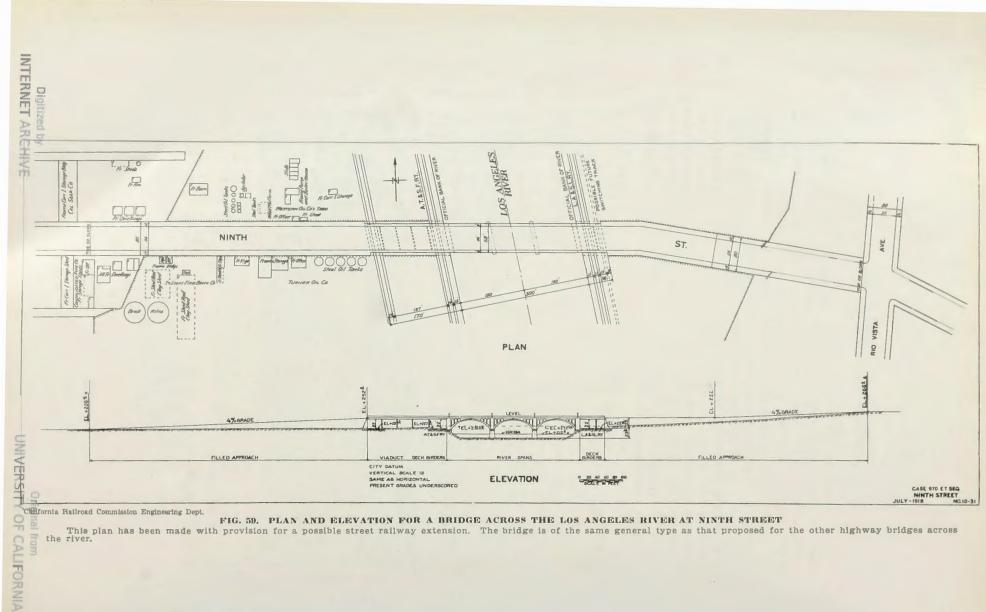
PLAN AND ELEVATION FOR A BRIDGE ACROSS THE LOS ANGELES RIVER AT NINTH STREET This plan has been made with provision for a possible street railway extension. The bridge is of the same general type as that proposed for the other highway bridges across the river. The new bridge suggested is of the same general type as that proposed for Seventh Street and should be built strong enough for street car loads. The approaches cross no streets. On the east side of the river the bluff is so near to the river bank that the approach could be carried horizontally until it intersects a 4 per cent grade to Rio Vista Avenue.
